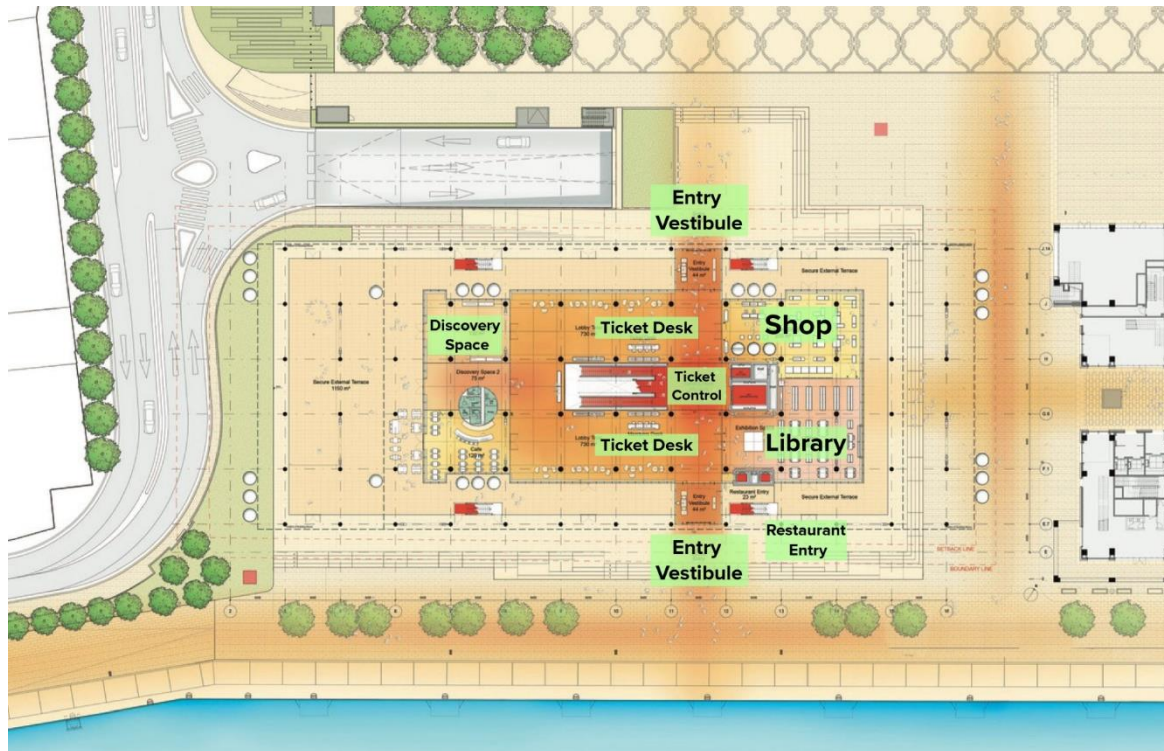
Ground Floor Plan of IMM (Pintos, 2023)
